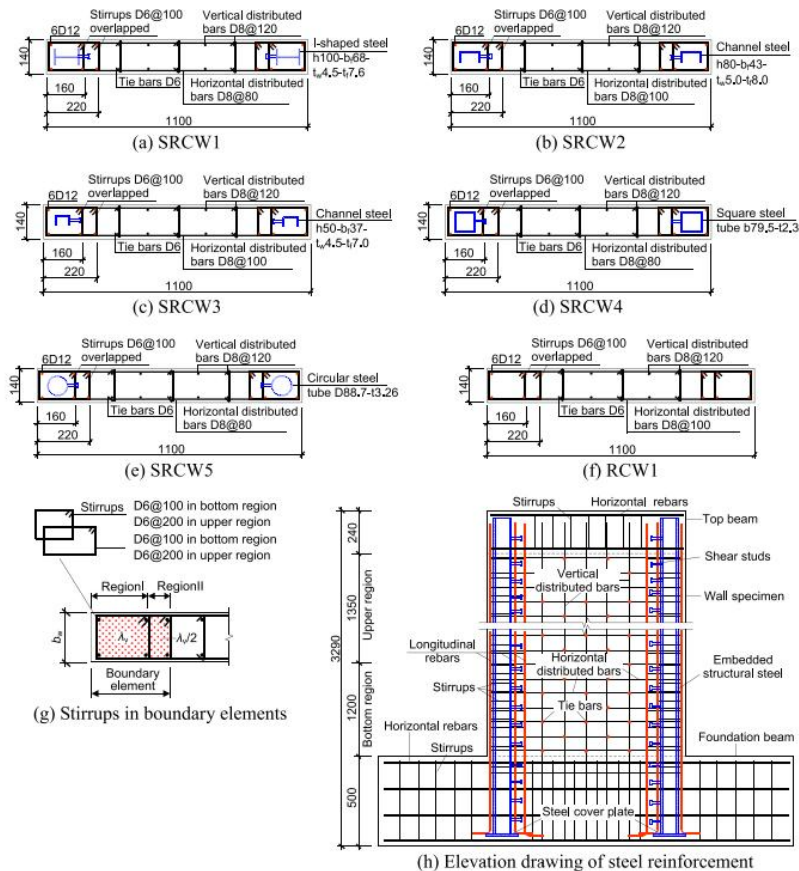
Details of wall specimens in Ji et al. (2015).
